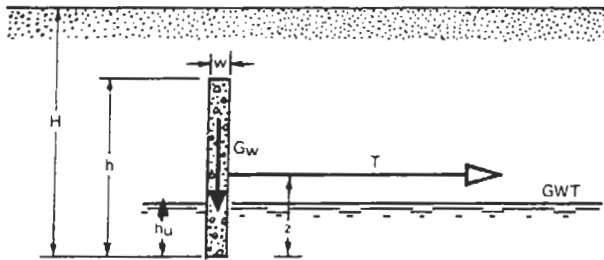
(a) — Geometrical parameters for an anchor slab.
